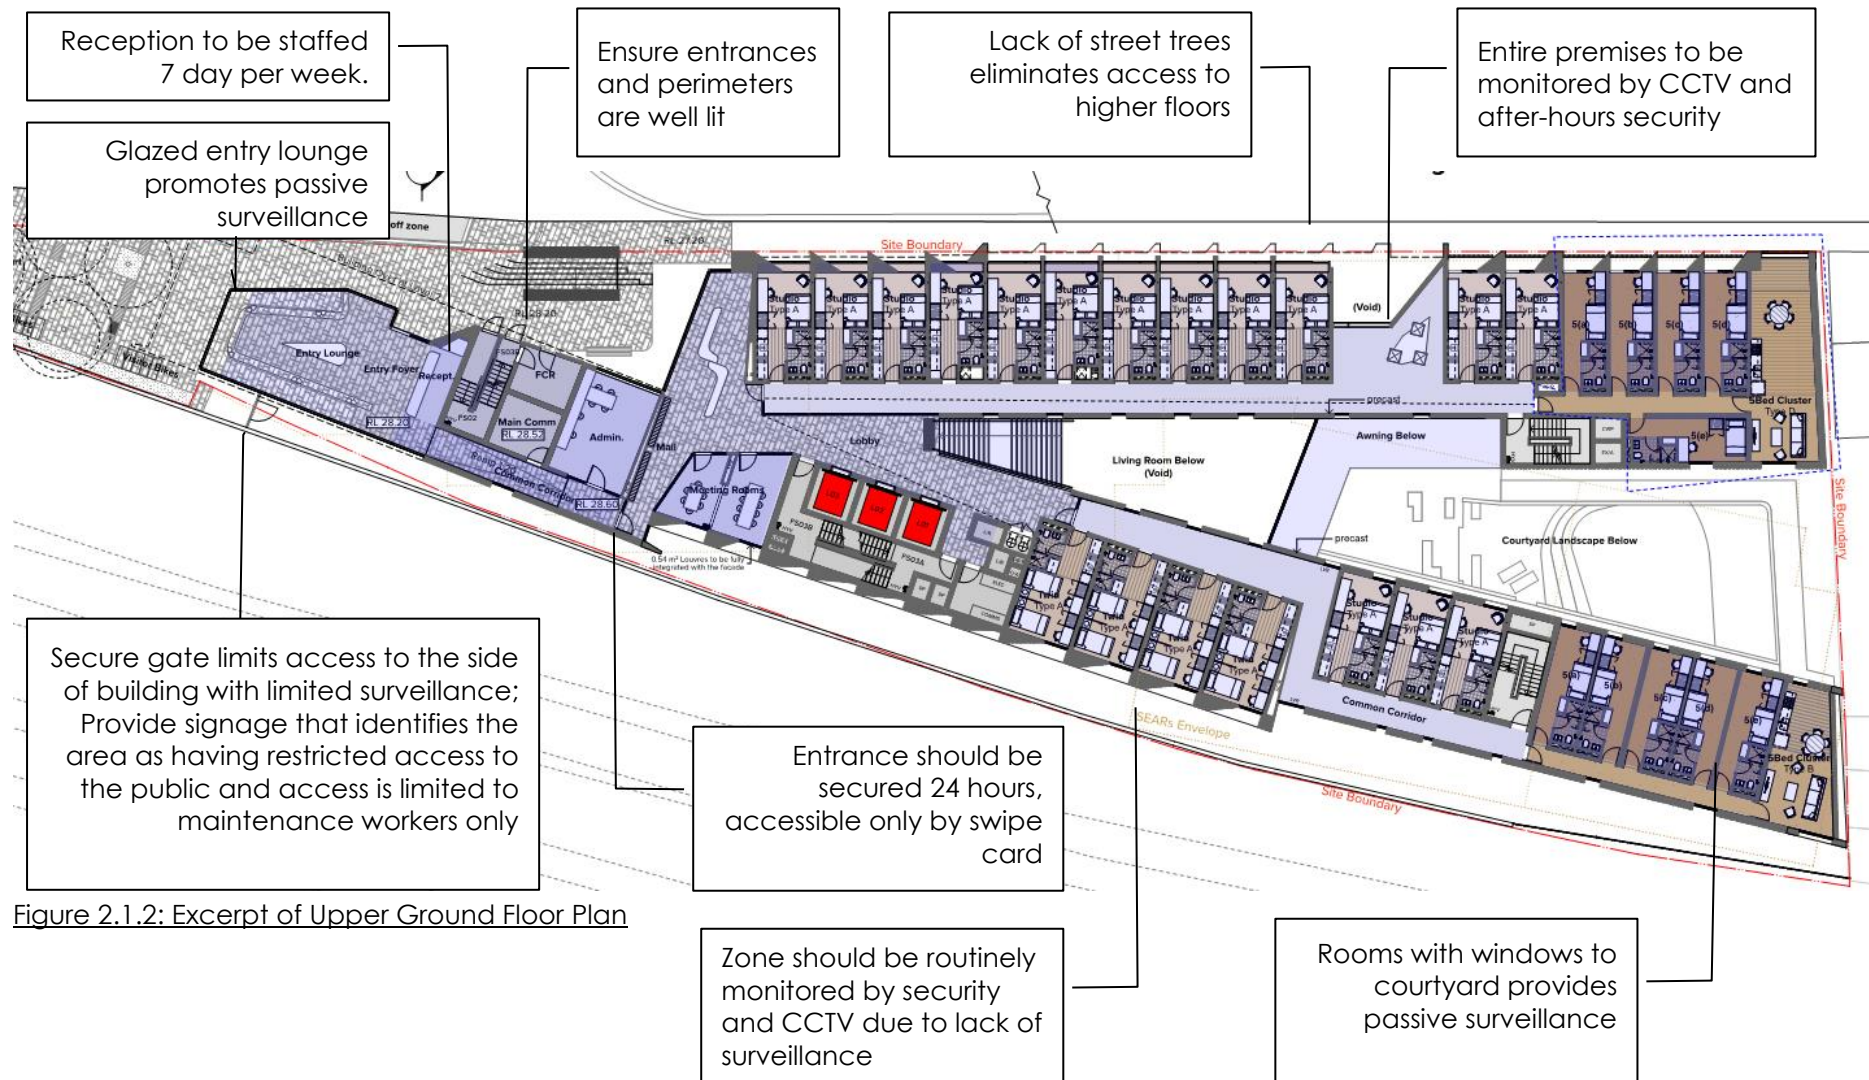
Excerpt of Upper Ground Floor Plan
